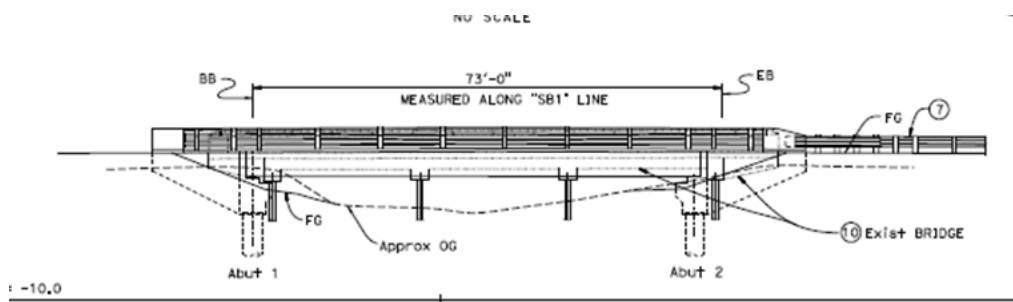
Design plans for bridge showing piles to be removed and new abutments outside of the channel.
